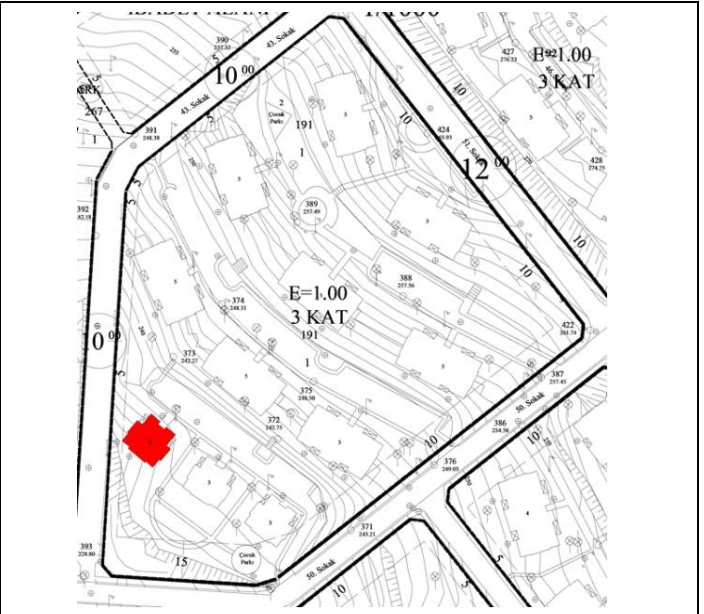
Type-1.2 The building was placed on the 191th island at 238 m elevation in the northeast-southwest direction. The residence area is approximately 210 m<sup>2</sup> with three floors and a total of 6 apartments.
